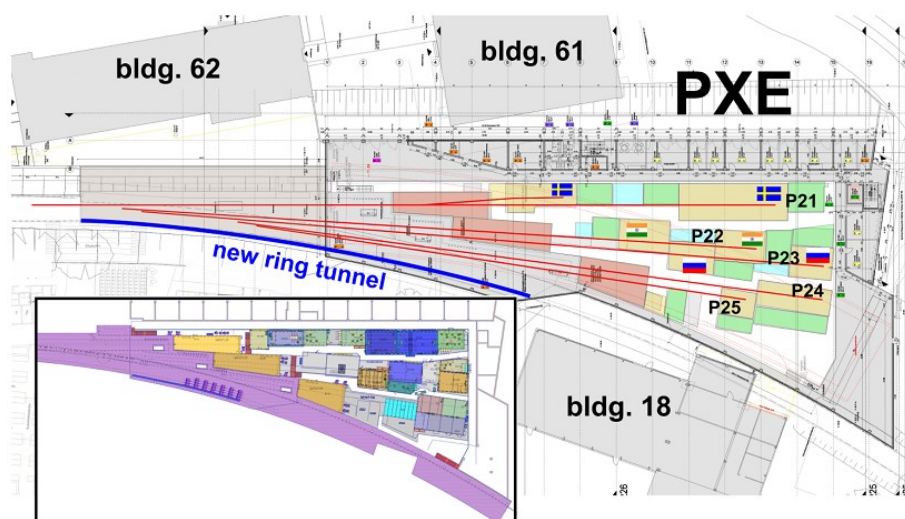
Schematic beamline arrangement and detailed floor plan (insert) of Hall East
